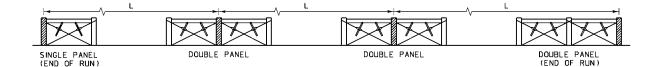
DETAILED DRAWING REFERENCE DWG. NO. 607-05 SECTION 607
